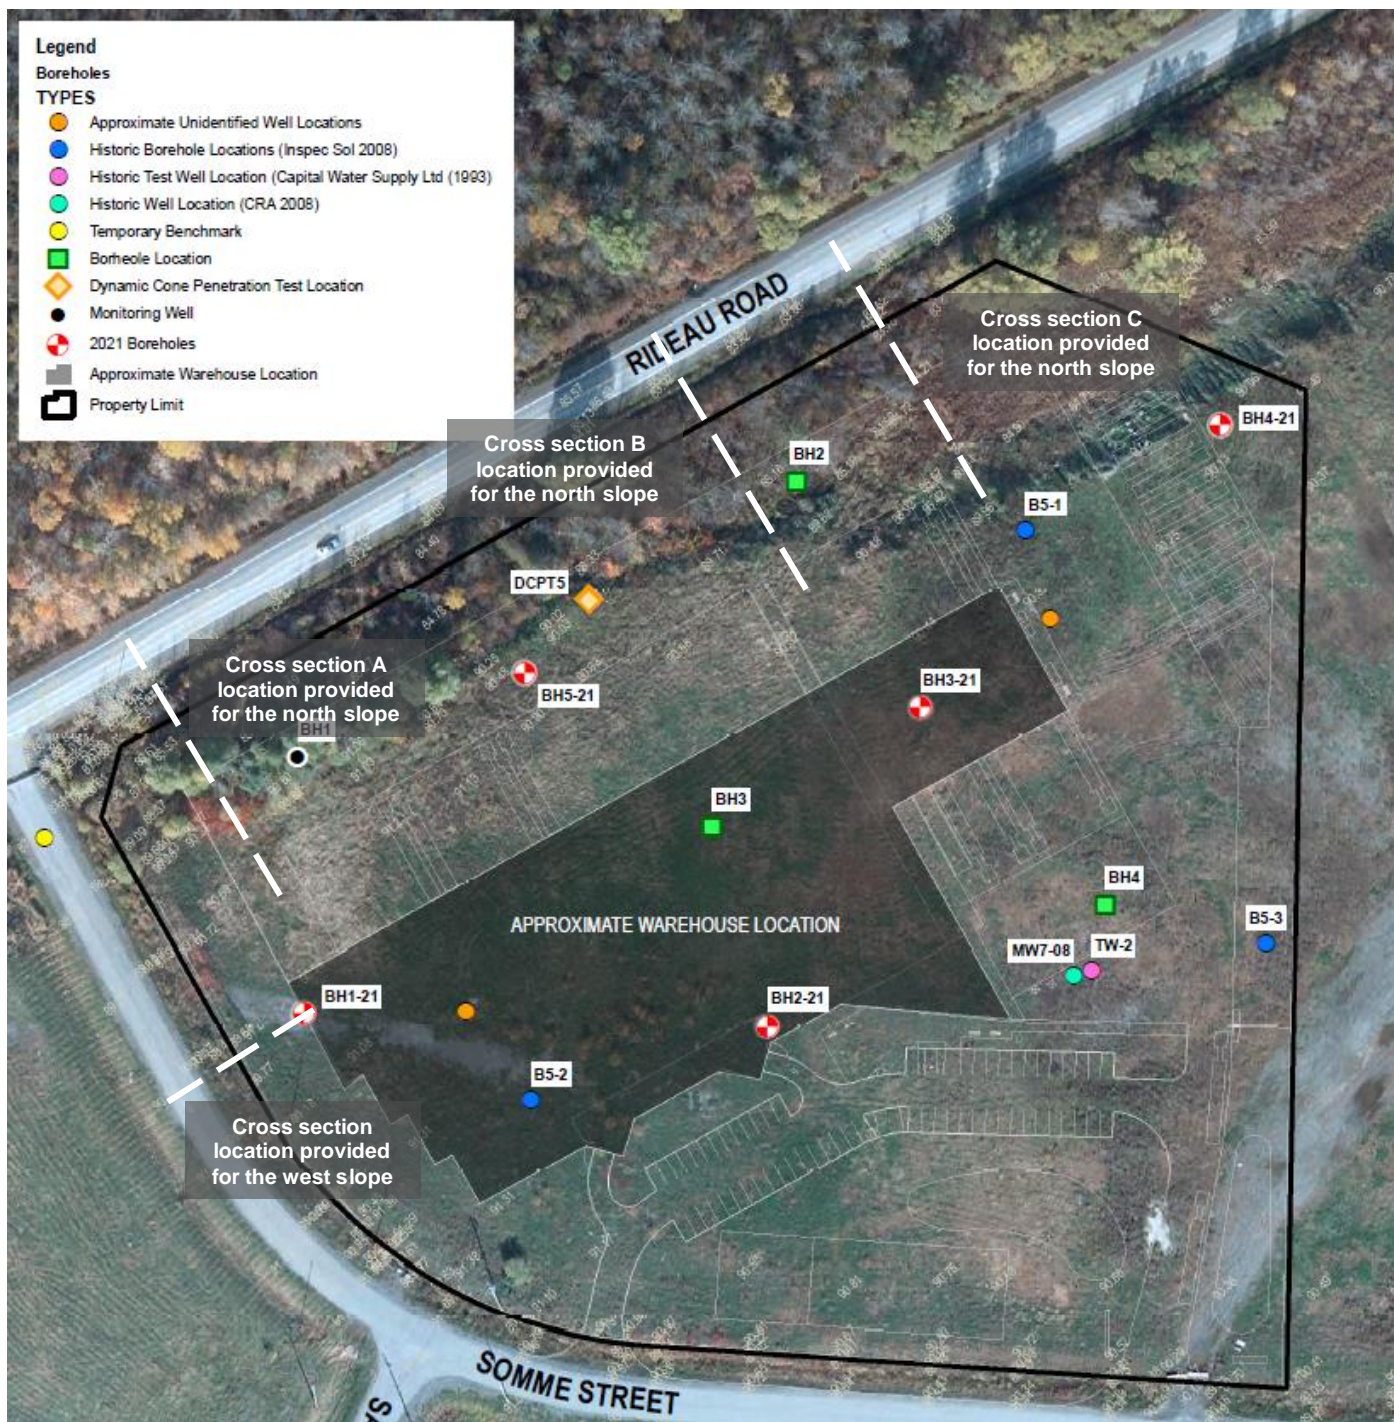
Site layout showing the location of the analyzed cross-sections and the proposed building footprint
